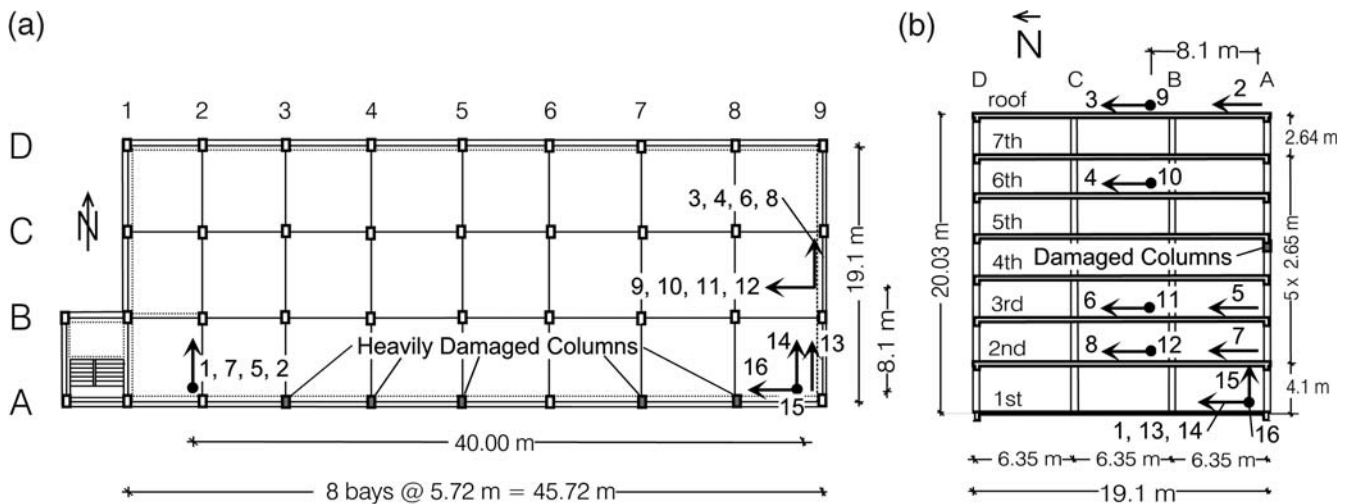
VN7SH building: (a) typical floor plan and (b) typical transverse section. Location and sensitivity axes of 16 acceleration transducers that have operated in this building since the mid-1970s.
